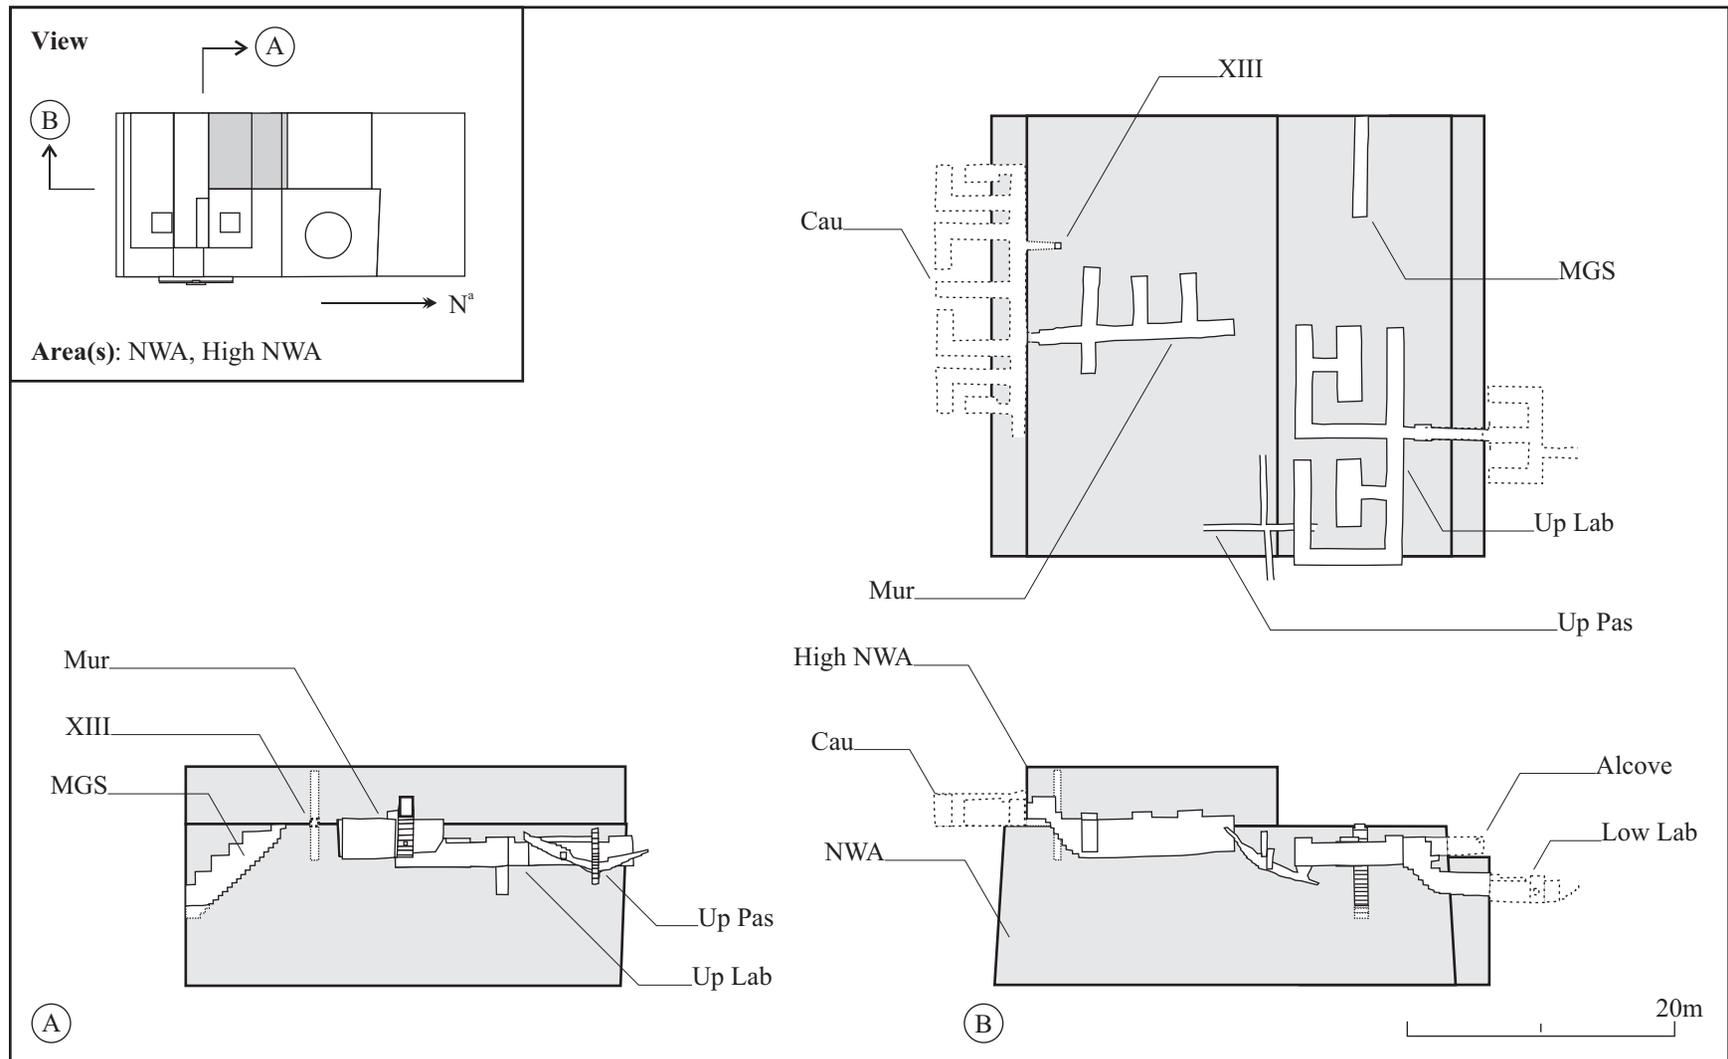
NWA (Northwest corner of Building A) area and galleries. Cau and Low Lab not shown in view (A).
